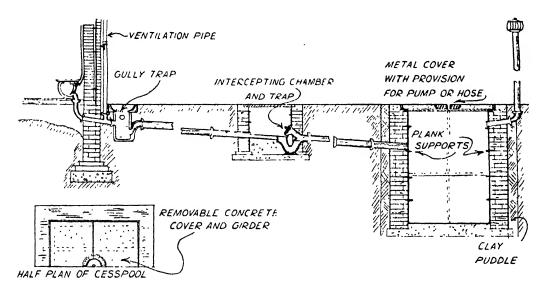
Fig. B.—House Drainage System with Cesspool. (Lower left). Half Plan showing Concrete Cover in Sections for Easy Removal.
